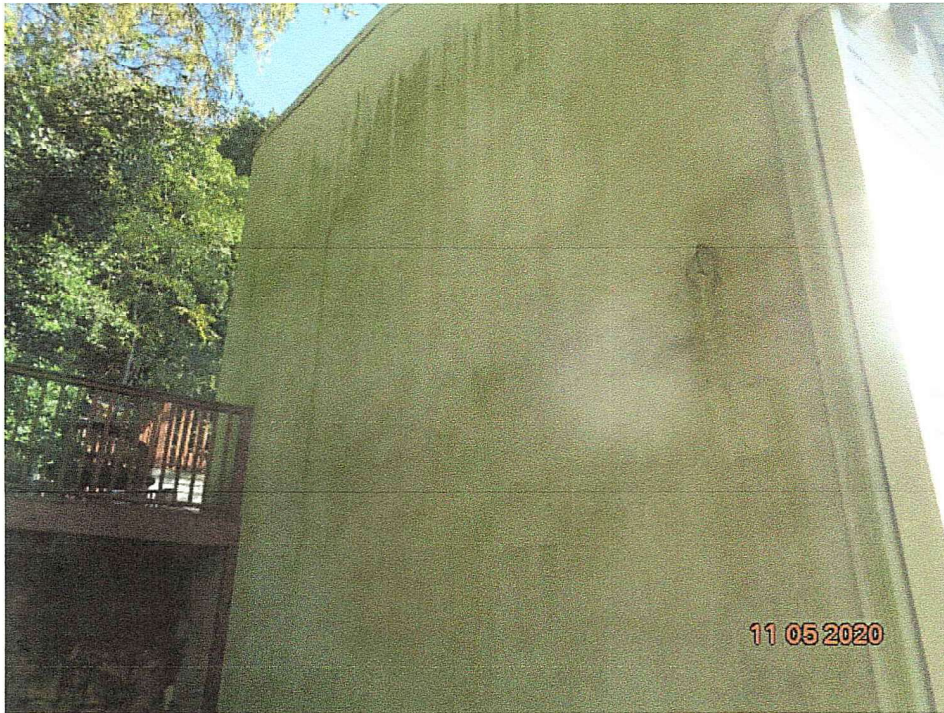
view looking in a northeast direction at front of the existing residence. Note damage guard rail at left side of photograph
